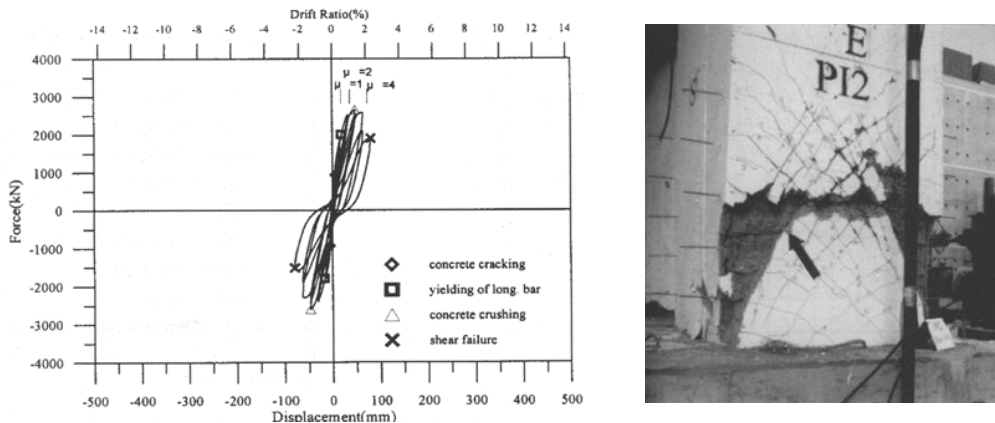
Hysteretic loops and damage state for Test PI2, Yeh et al. (2002)
